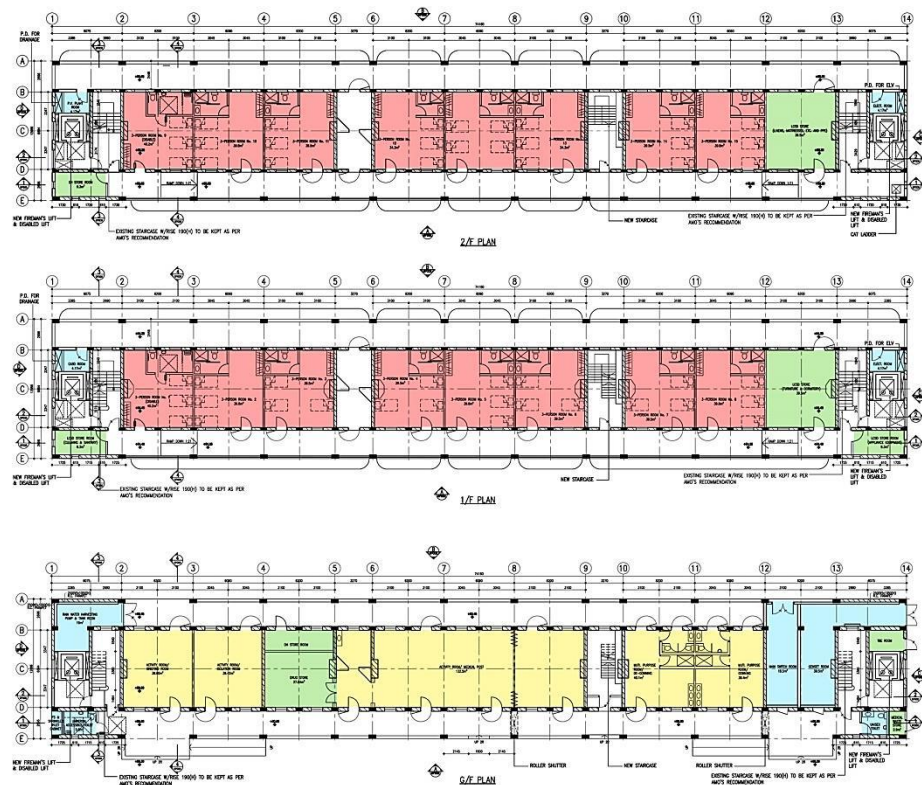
Floor plans (Source: Architectural Services Department) Edited by Hannah Liu
